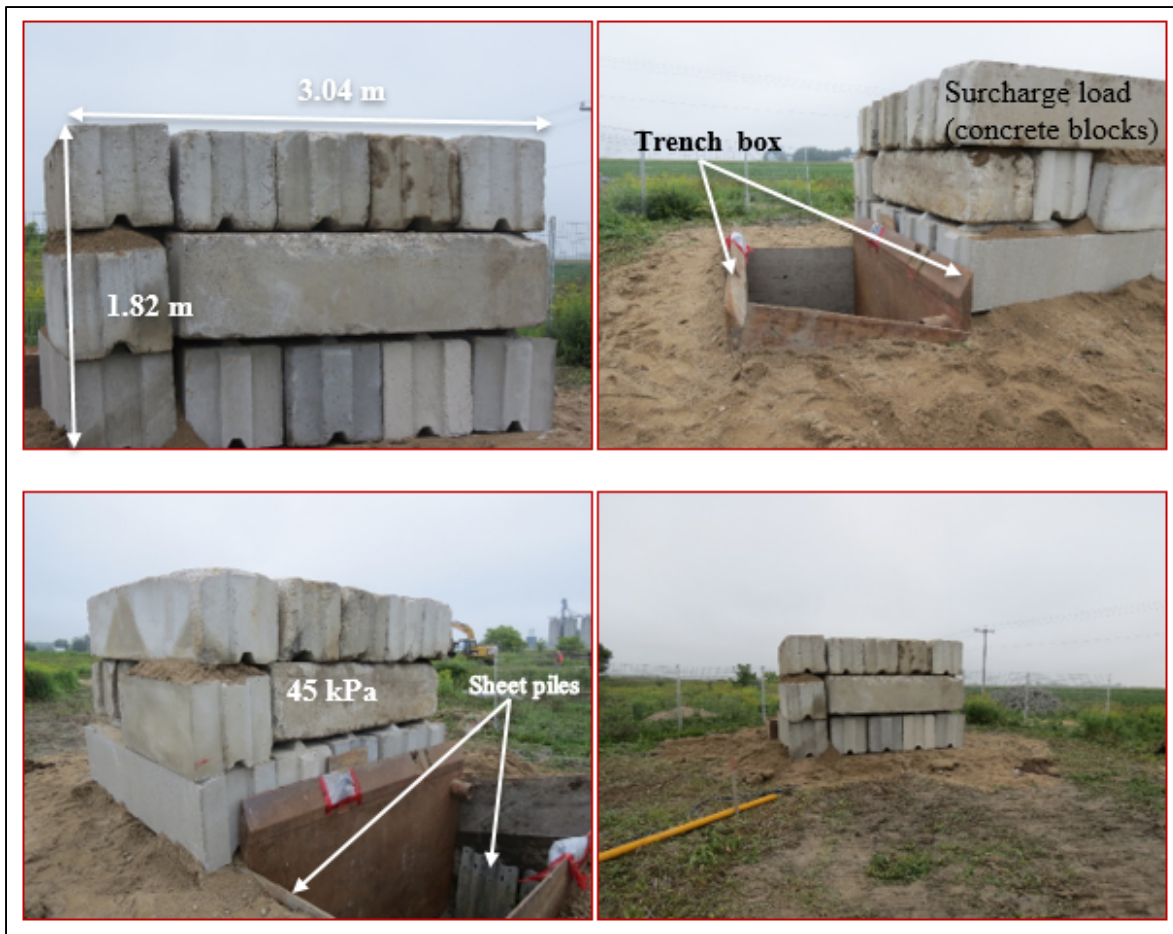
Concrete blocks (surcharge load) installed on one side of the trench
